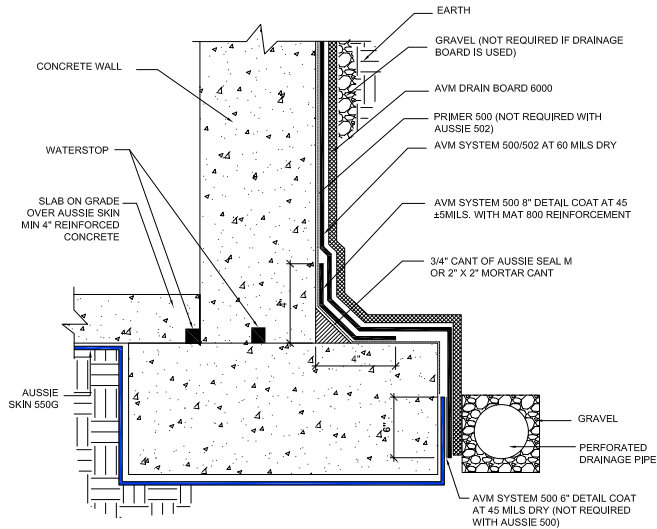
SLAB ON GRADE OVER AUSSIE SKIN
